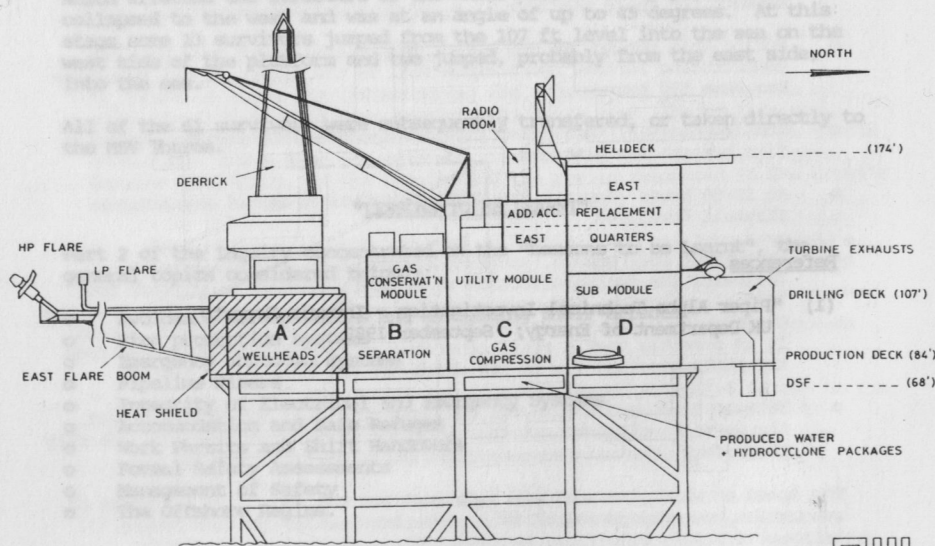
PIPER ALPHA - EAST ELEVATION
